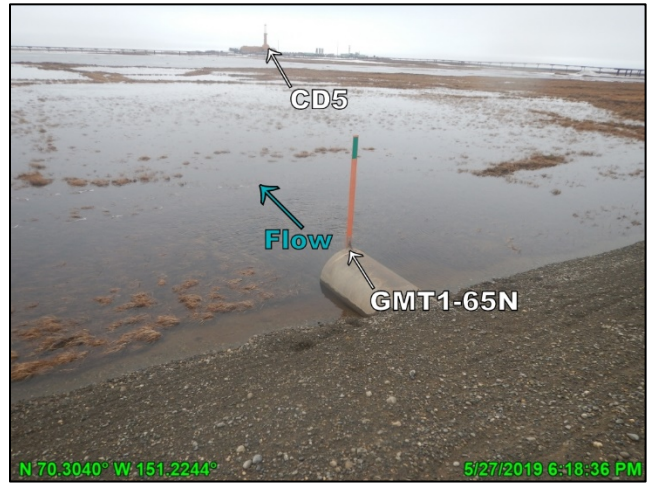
Culvert GMT1-65 conveying flow, looking north; May 27, 2019
